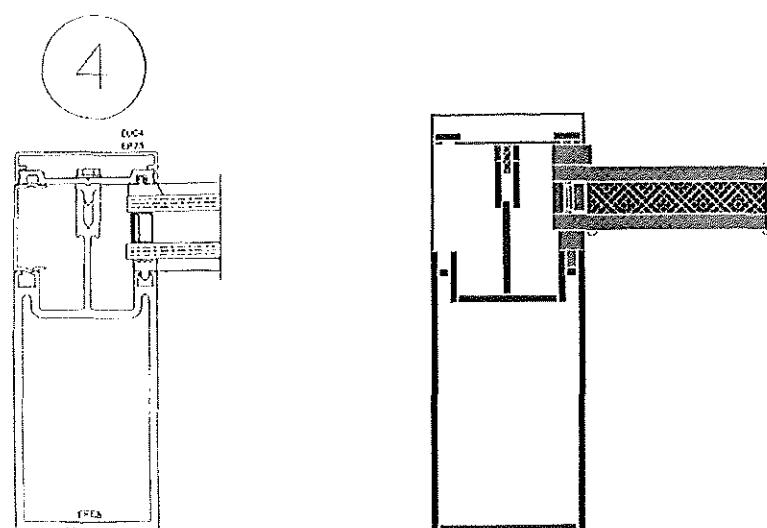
Detail and FRAME model of the curtain wall jamb section.
